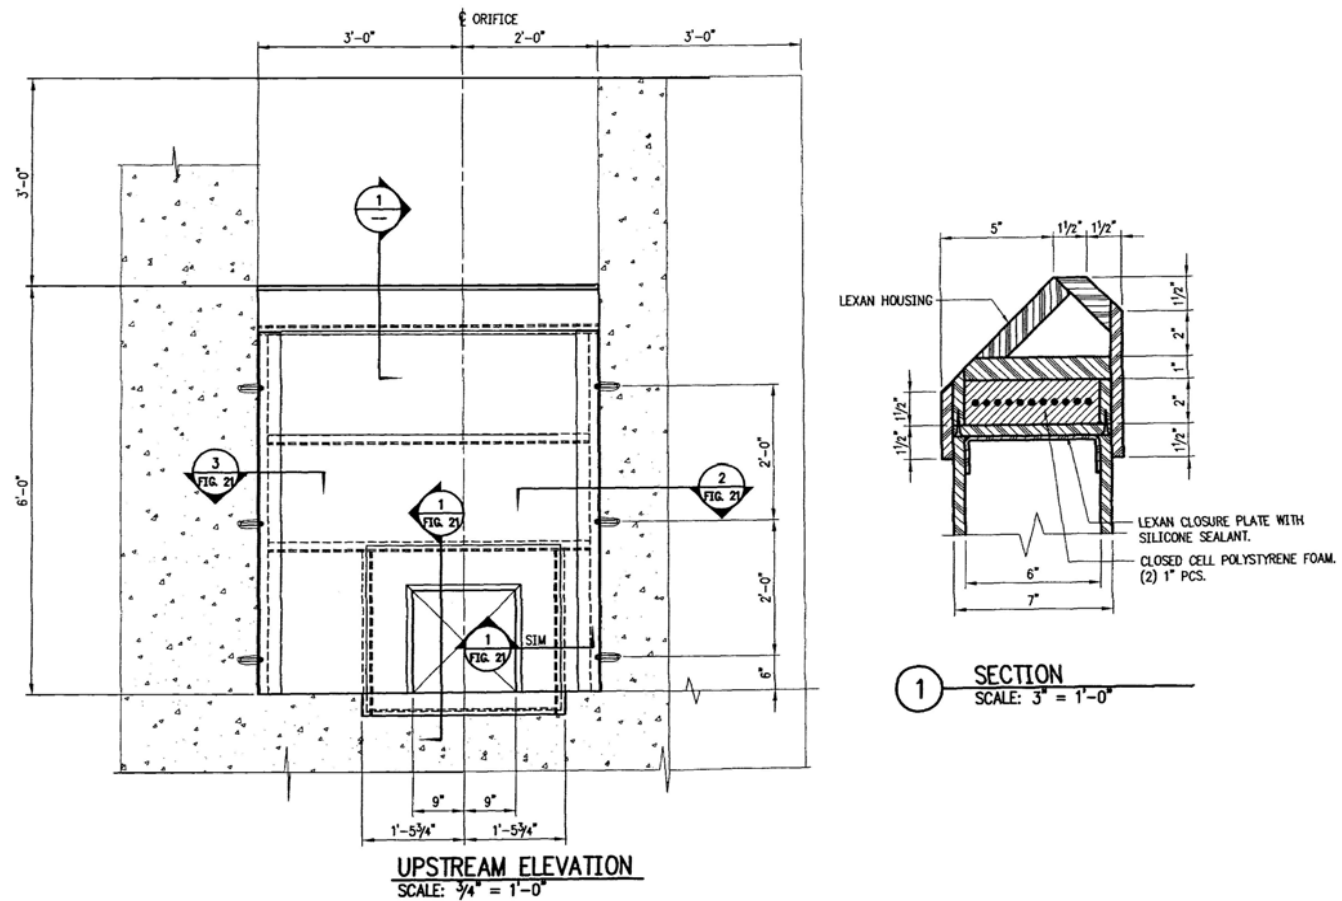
Orifice/ Weir Antenna Housing - Elevation and Section (Structural Fiberglass)
